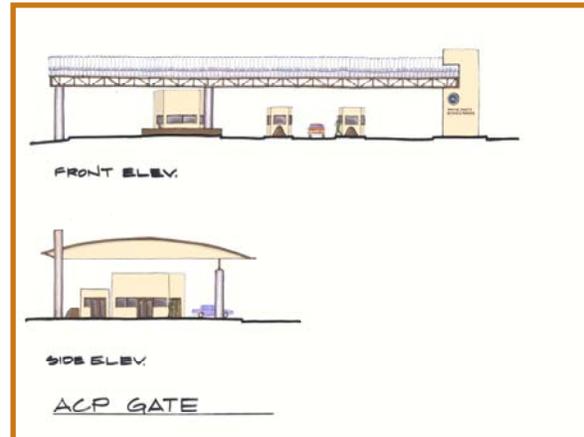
Proposed metal roof for the ACP Facility.
